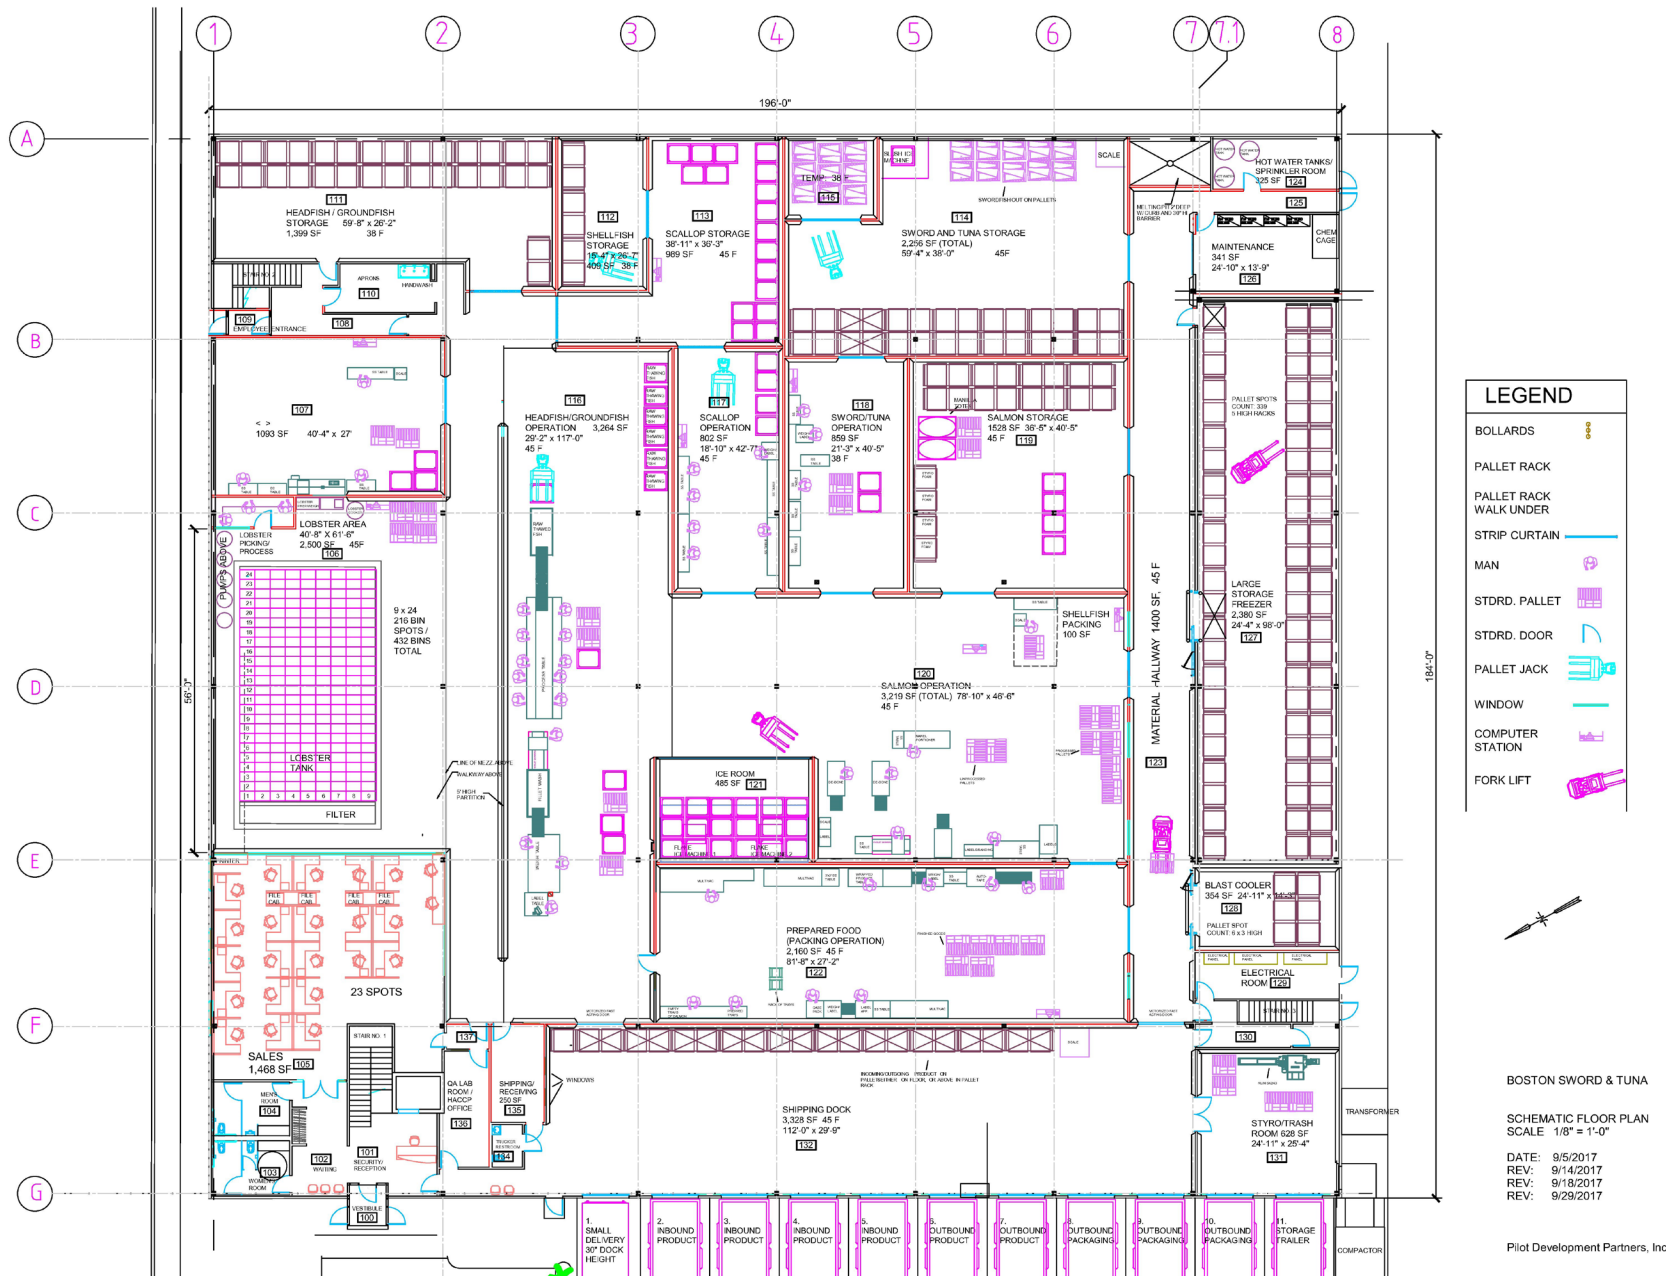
Boston Sword & Tuna. Schematic Floor Plan
